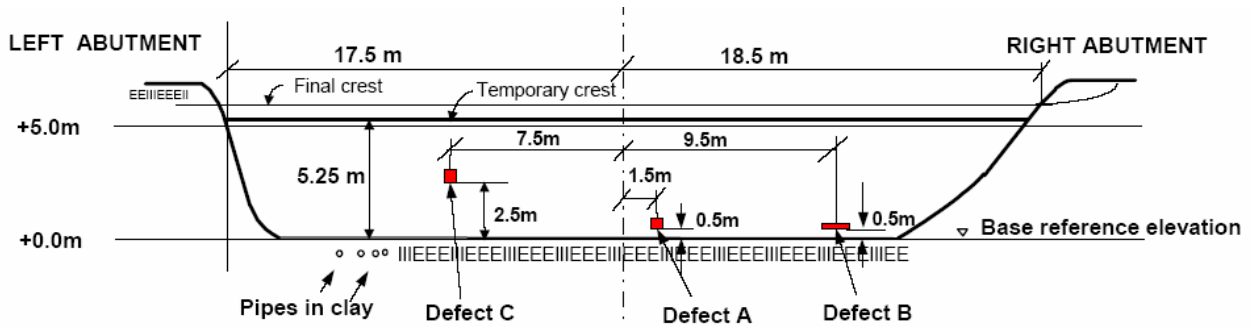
Location of the defects; Defect A at chainage 19m, Defect B at chainage 27m, and Defect C at chainage 10m.
